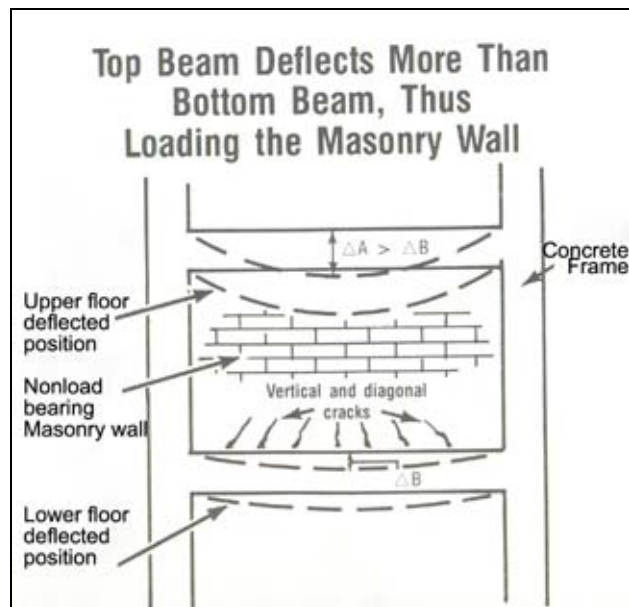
Beam crack due to excessive load (*Source: Nondestructive evaluation & testing of masonry structures by Suprenant and Schuller*)
